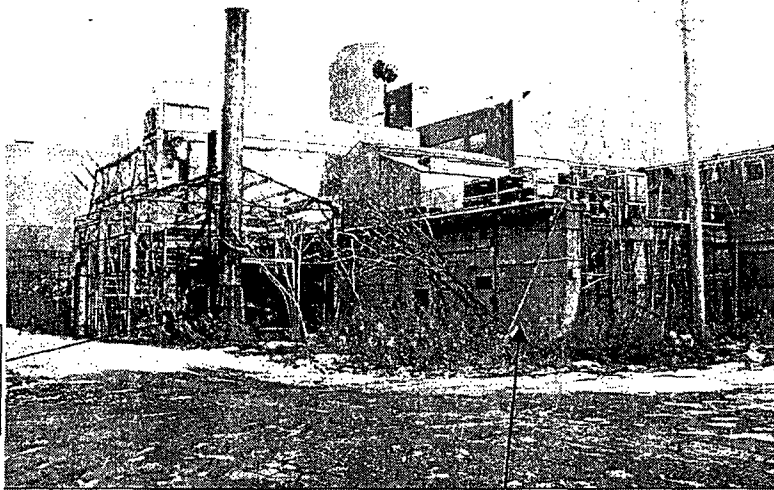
SAPS turbine-generator. Plywood structure was built after plant was decommissioned.
